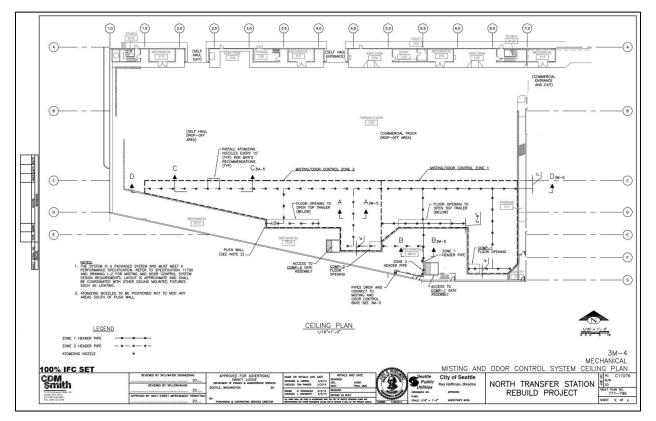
Spray Nozzle System Layout (From SPU Facility As-built drawings)
